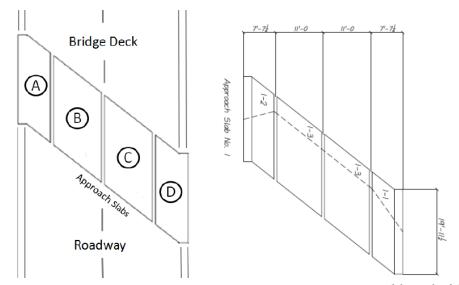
Plan view of precast concrete approach slab panels (Ziehl et.al., 2015)
